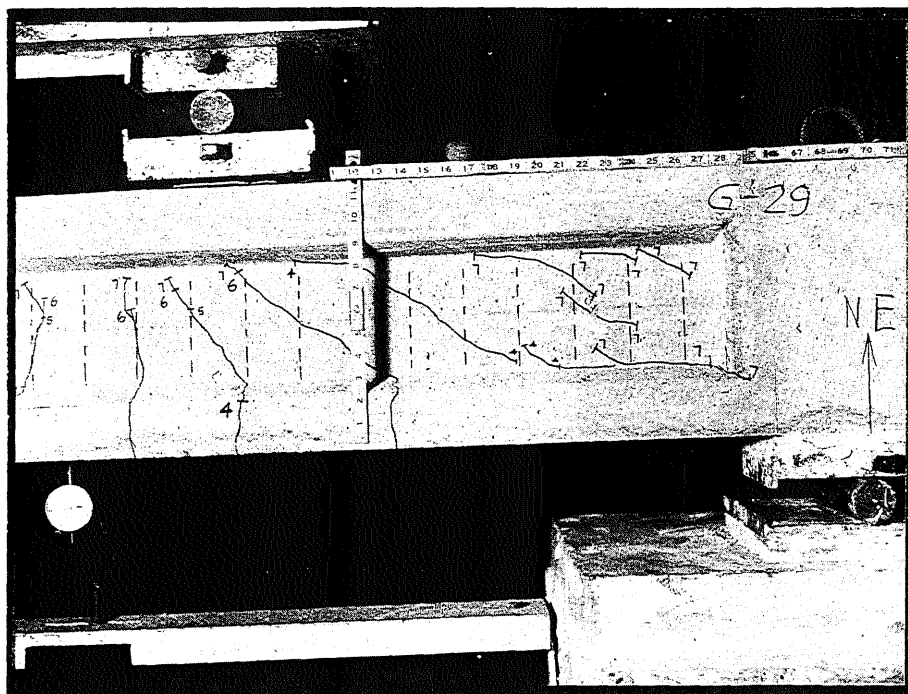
SECONDARY INCLINED TENSION CRACKING
